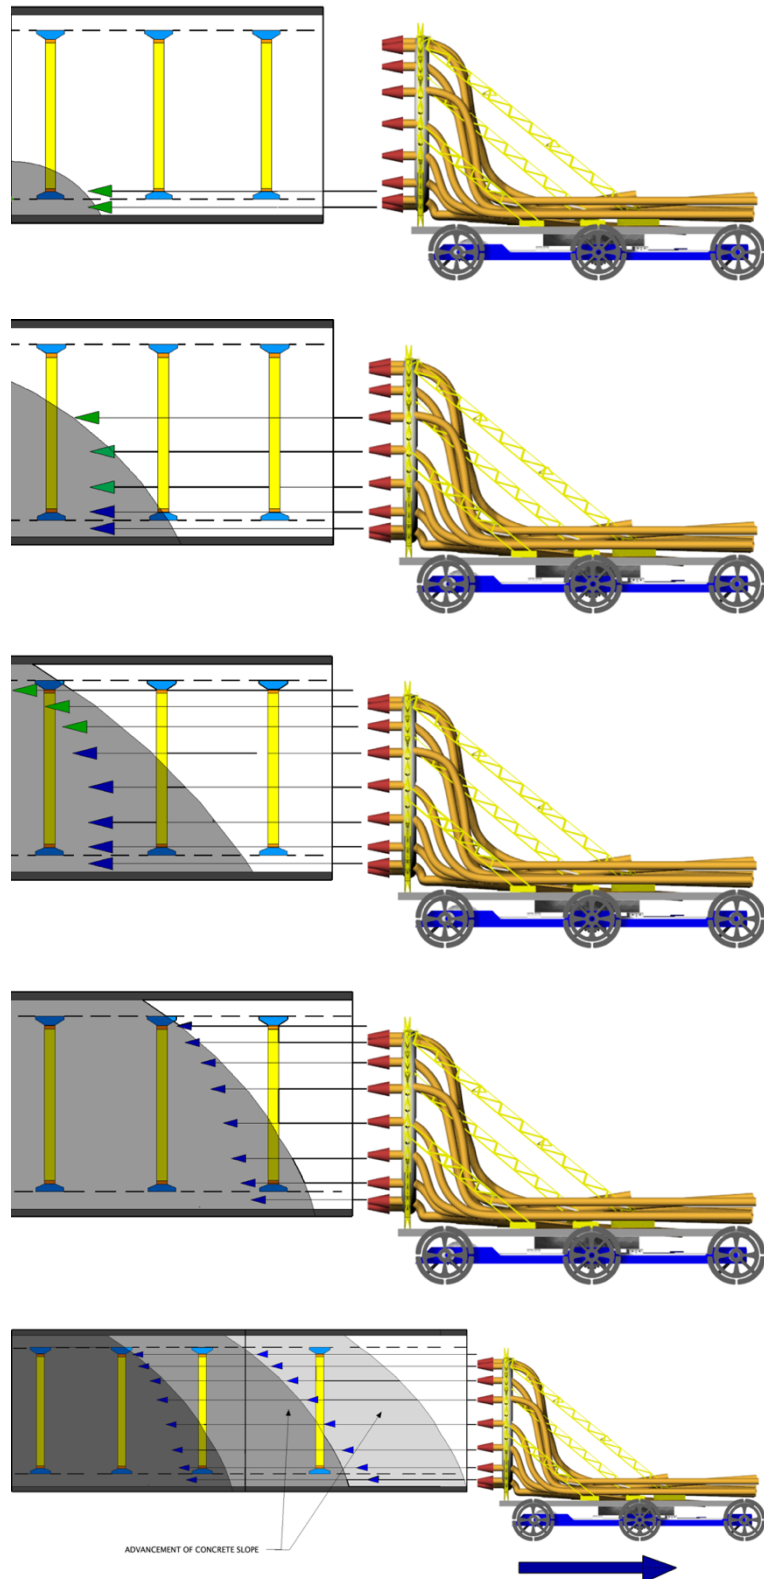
Concrete crown in operation, concept of advancing concrete heap
